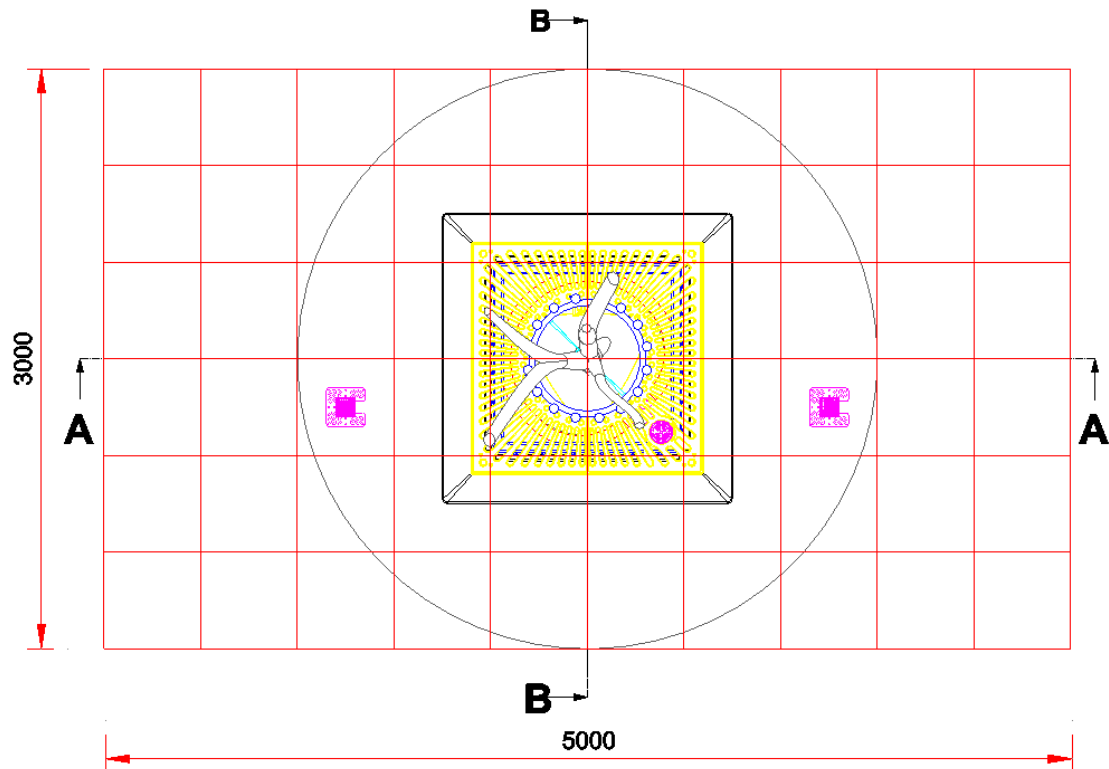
Typical GreenBlue Urban ArborFlow Plan Area
